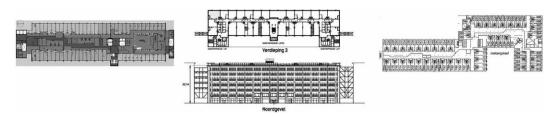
Floor plans of ACTA/Go-West & Blue-Gray.
